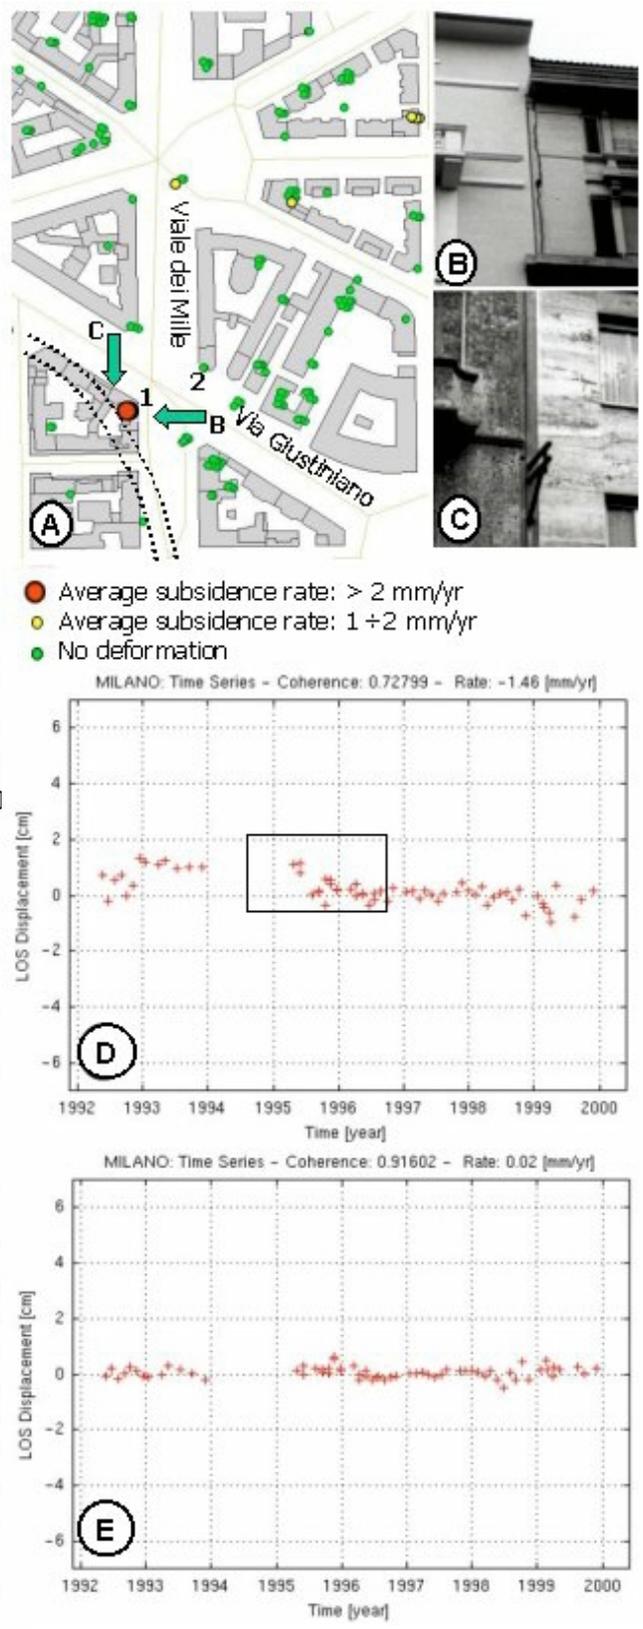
A. PS in GIS environment [4]. Track of the underground tunnel, positions from which photos B and C have been taken. B. Fissuring started 1989 when the pilot tunnel was excavated. C. Structural damages are less evident due to recent restorations. D., E. LOS displacement time series relative respectively to PS marked 1 and 2 in A.
